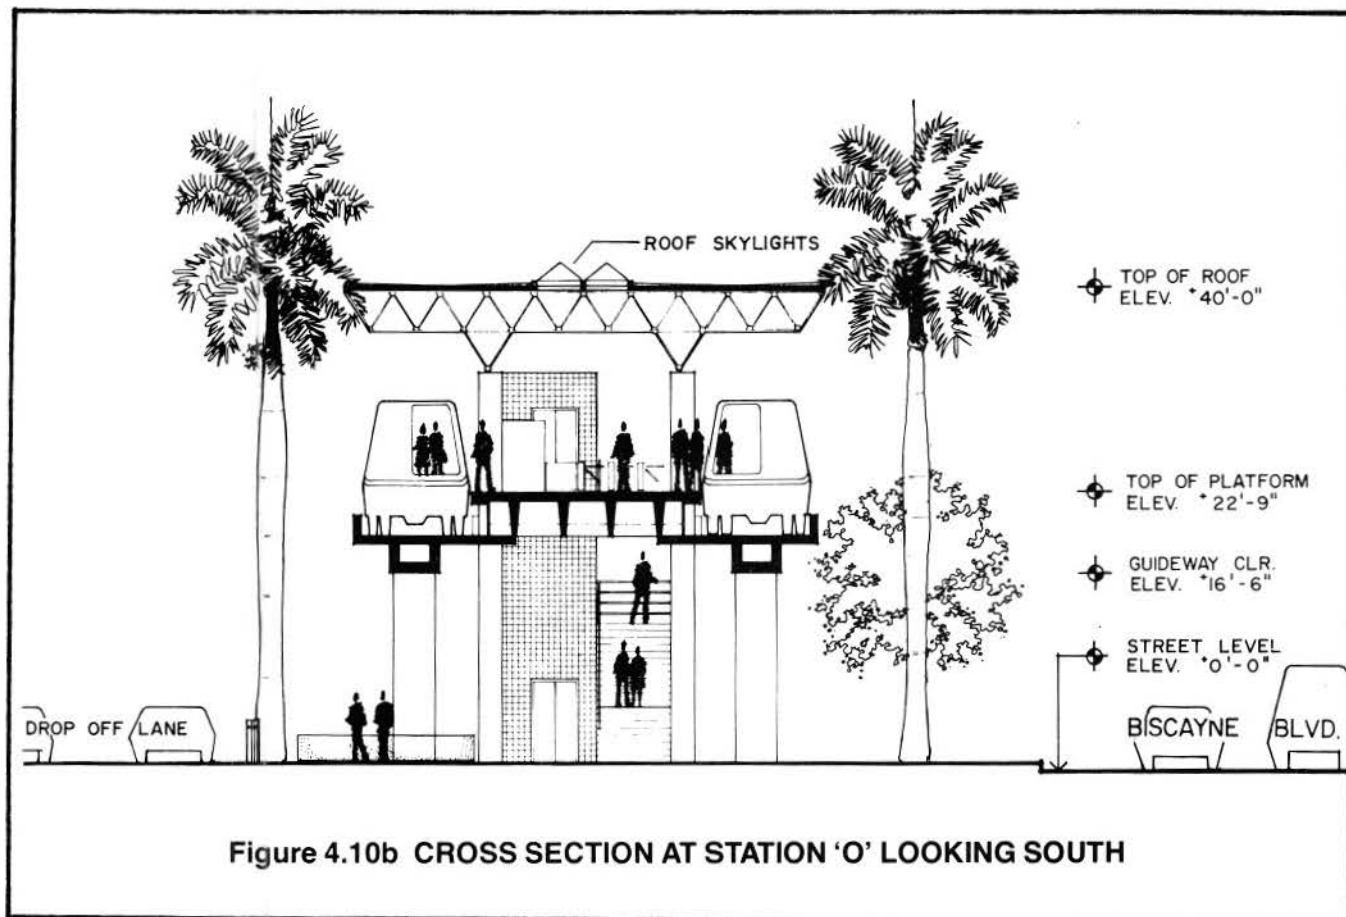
CROSS SECTION AT STATION 'O' LOOKING SOUTH
